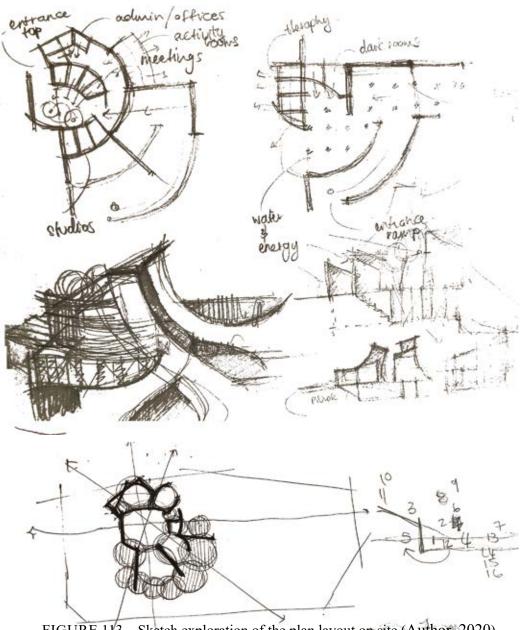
Sketch exploration of the plan layout on site (Author, 2020)
